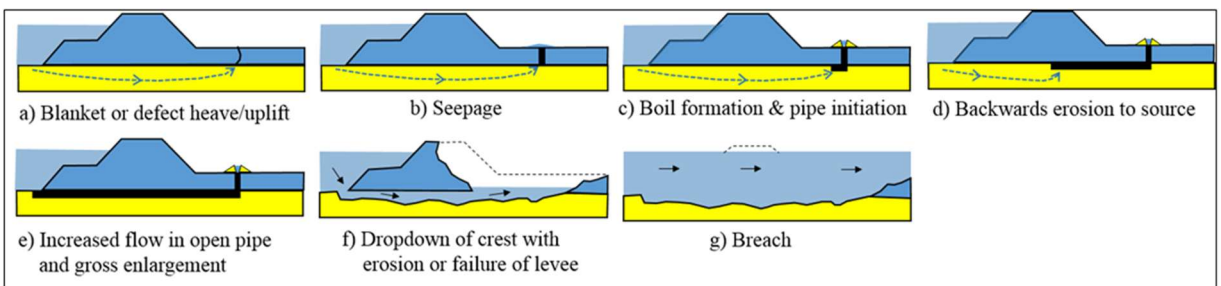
Backward Erosion Piping Through the Foundation (Adapted from van Beek et al. (2010))
